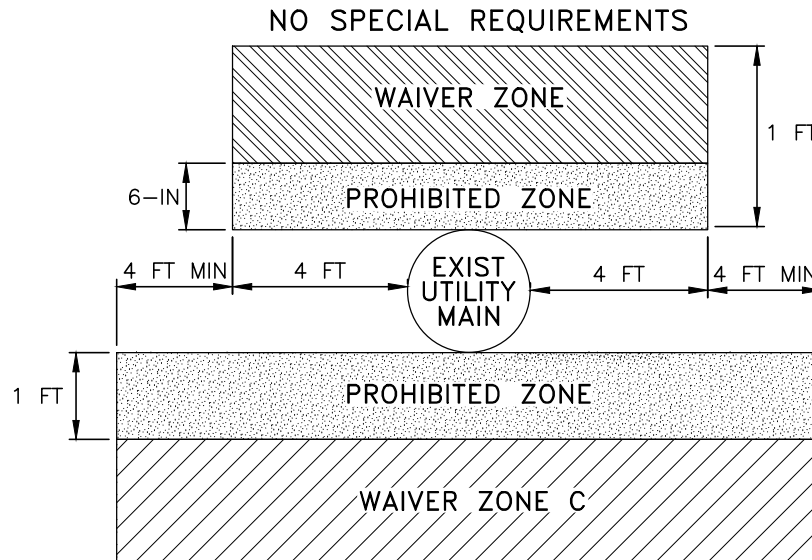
SECTION 64572 (D) NEW WATER MAIN CROSSING CONSTRUCTION
